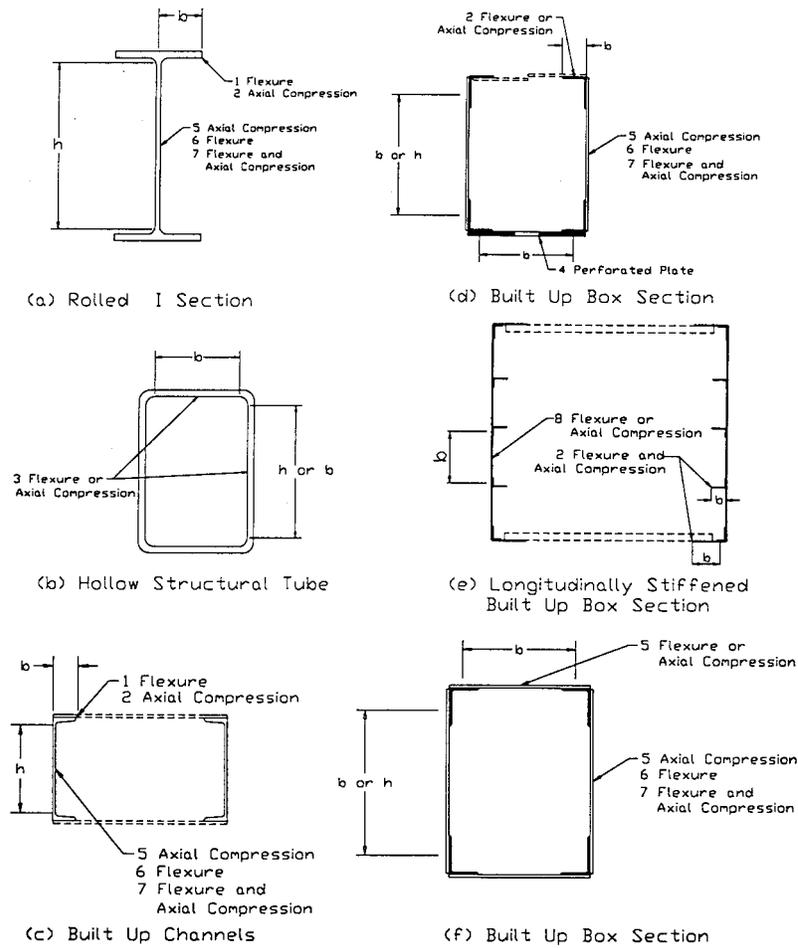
Typical cross-sections for steel members (SFOBB west spans).
